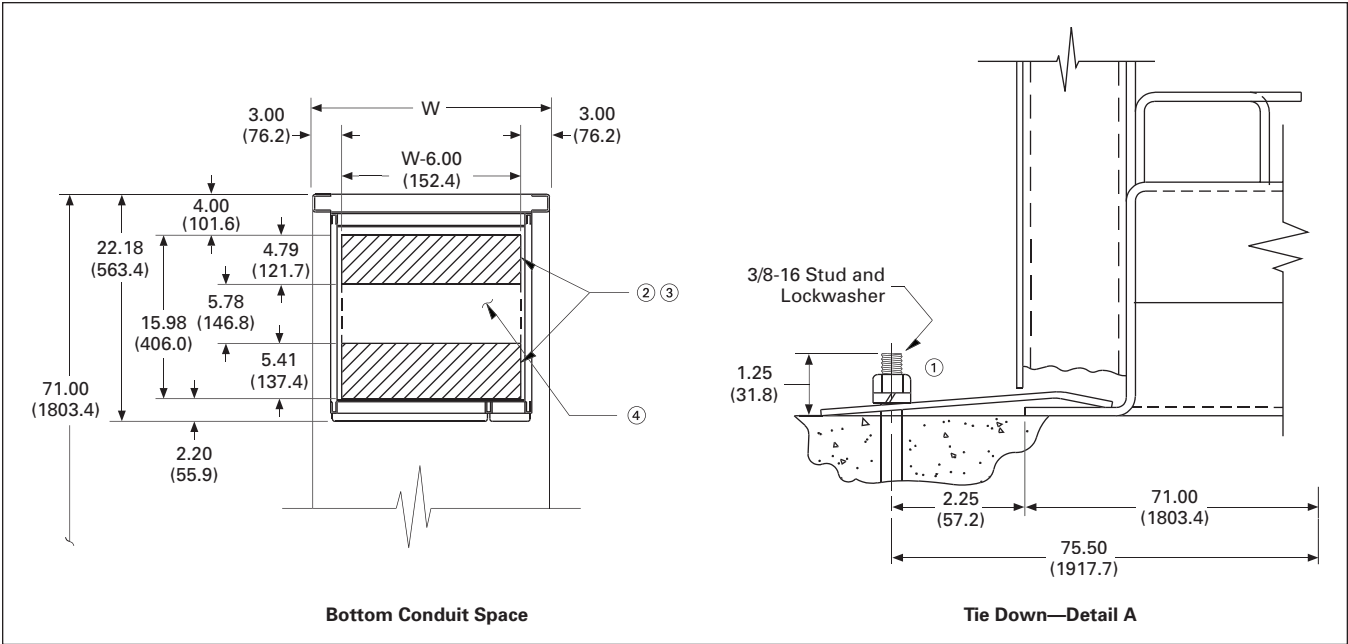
NEMA 3R Walk-In Aisle Structures—Dimensions in Inches (mm)
